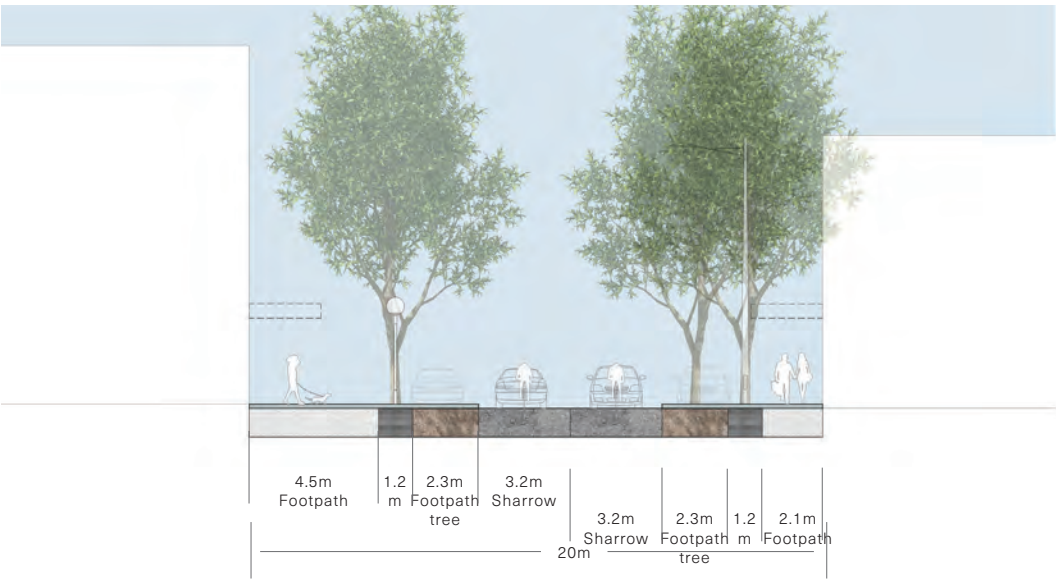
(Top) Bayley Street section B-B' showing the proposed long-term condition
